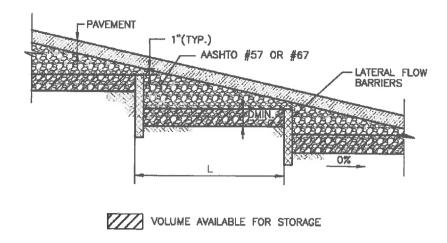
Permeable Pavement Profile, Stepped Installation
